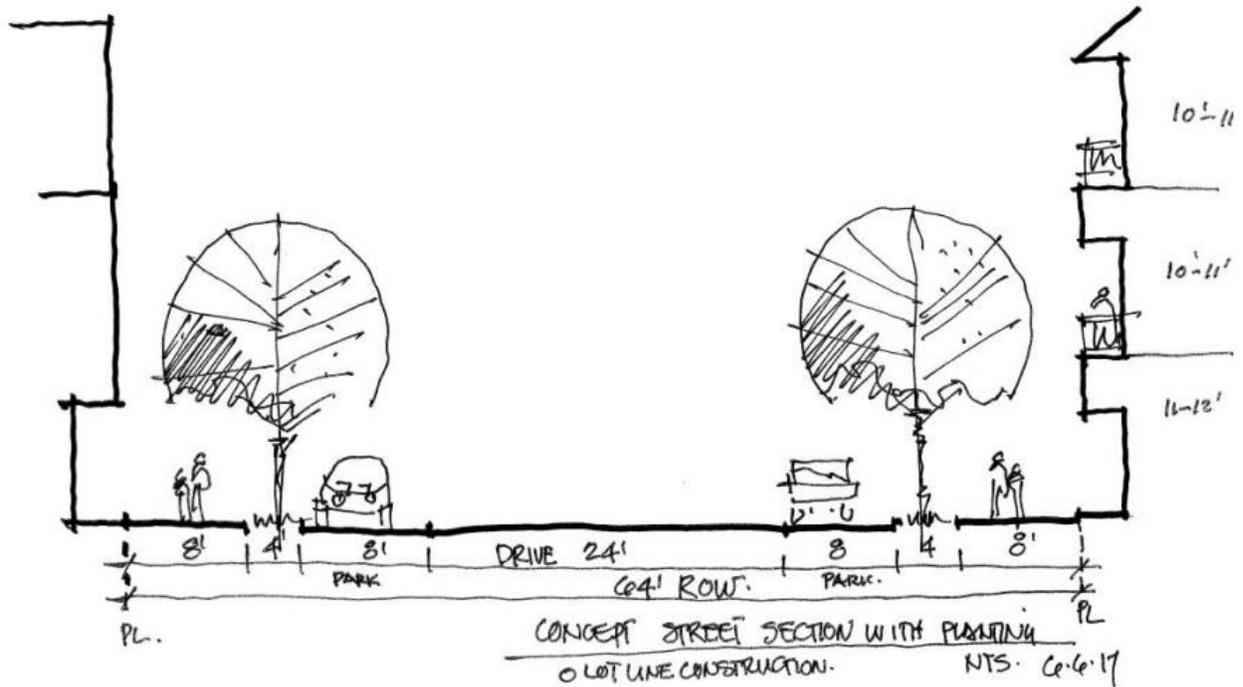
MAIN STREET SECTION B- with planting strip along road
